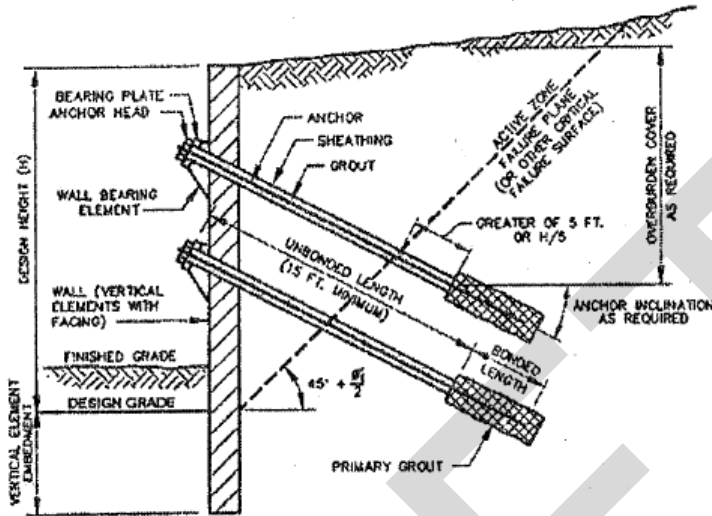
Anchored Wall Nomenclature and Anchor Embedment Guidelines.
